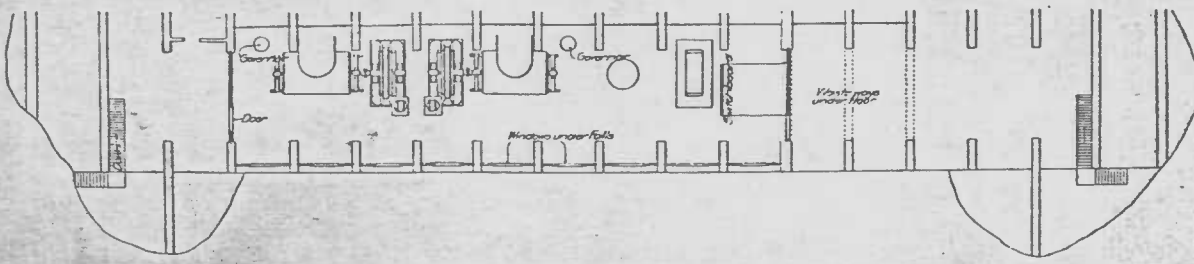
PLAN VIEW OF DAM, SHOWING LAY-OUT OF MACHINERY.
